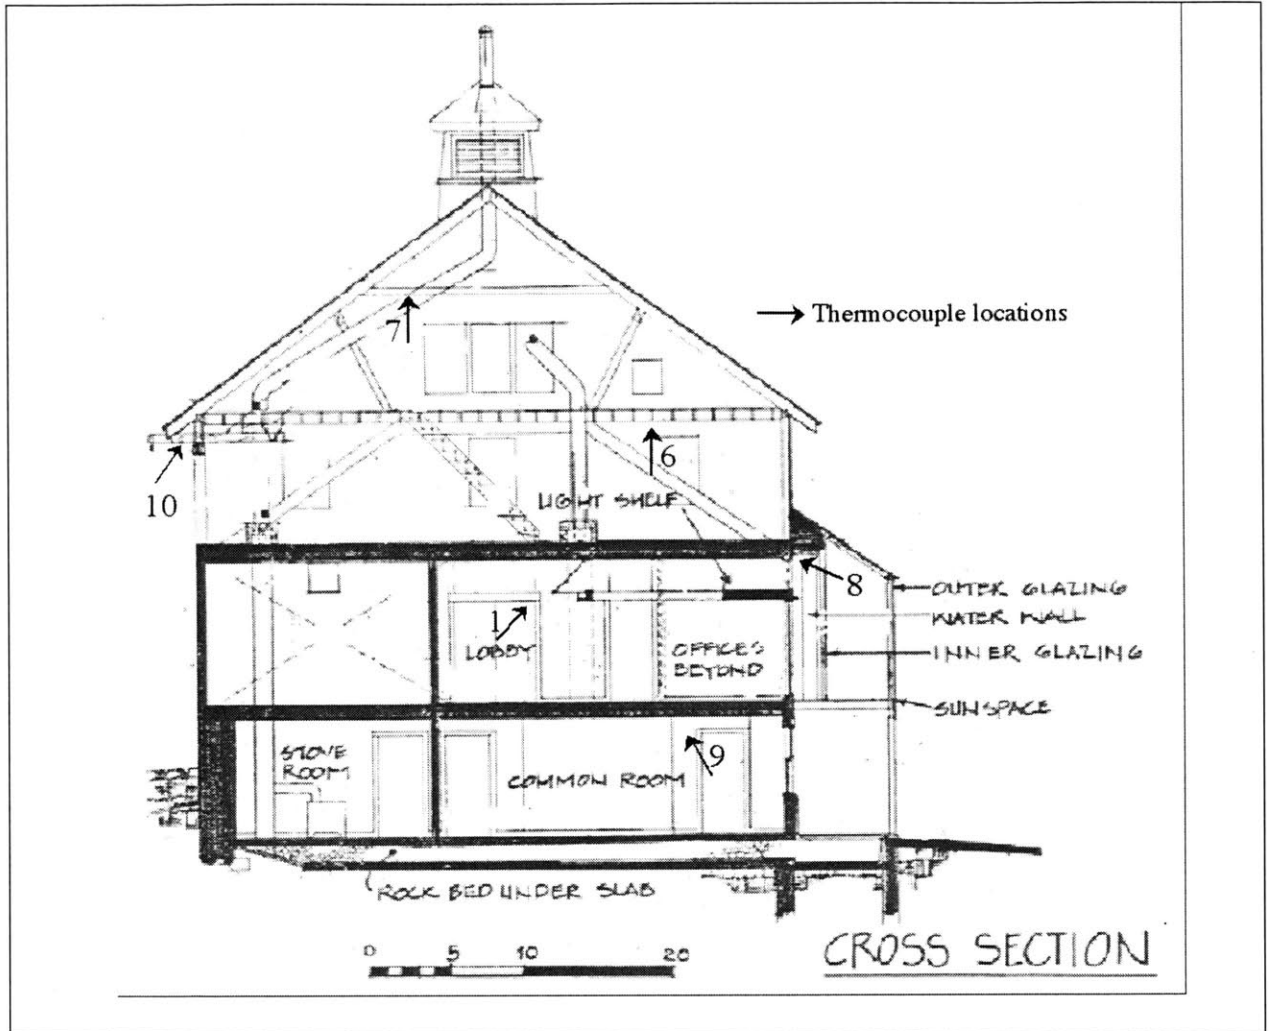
Building cross section, showing locations of selected thermocouples. (Section courtesy of Gerard Ives.)
